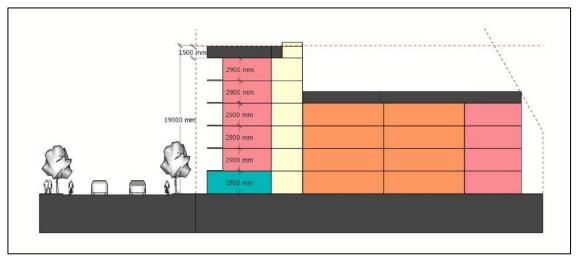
Diagrammatic section depicting possible floor to floor configurations for a building measuring 19m in height
